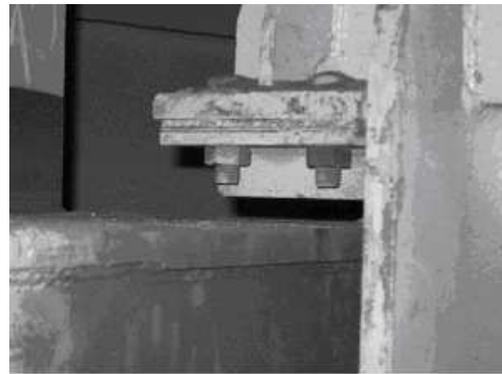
Filler metal for a hook latch Fig. 8. Latch hook.
